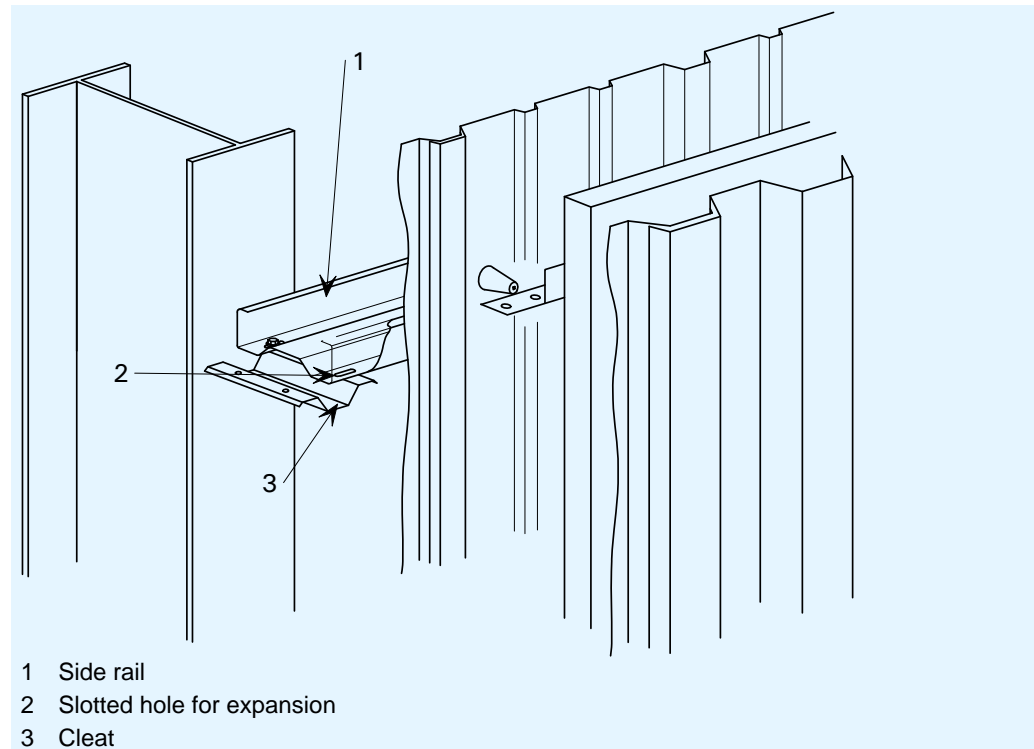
Typical fire wall details showing slotted holes for expansion in fire
